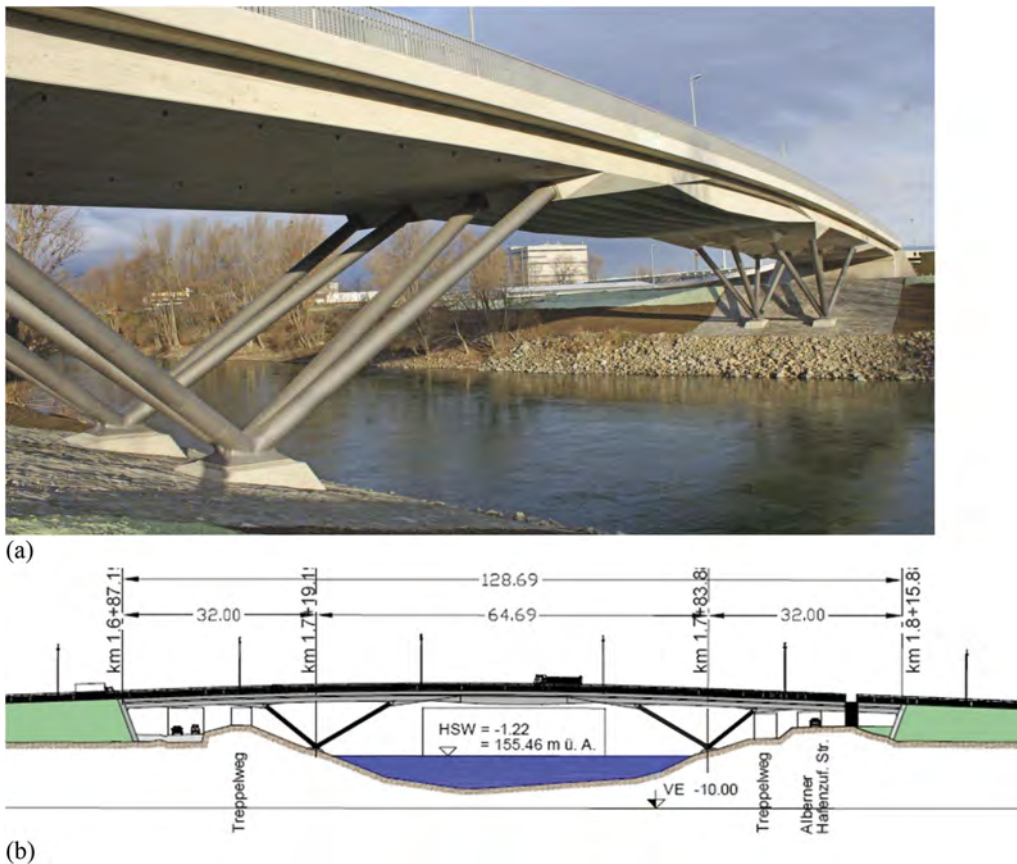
The Seitenhafenbridge crossing the Danube Channel in Vienna, Austria. (a) General overview and (b) Longitudinal section (Geier et al., 2009).
